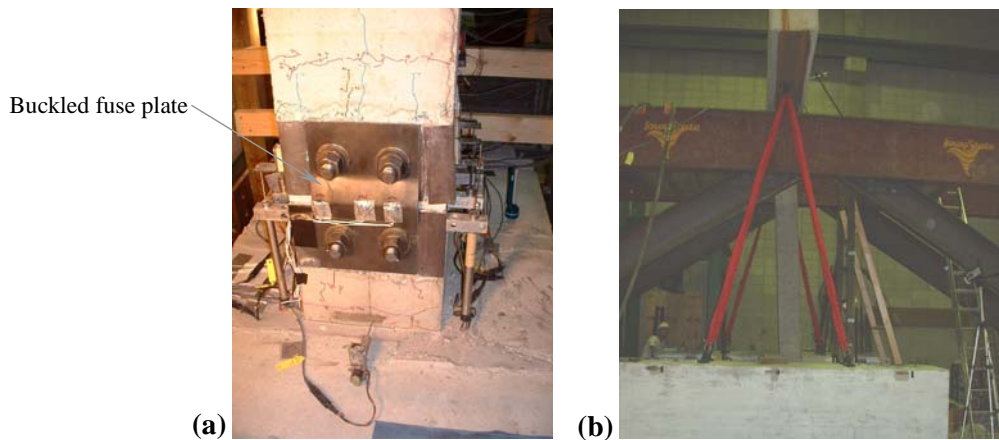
(a) Buckled fuse plate with cracks in column, (b) Displaced column
